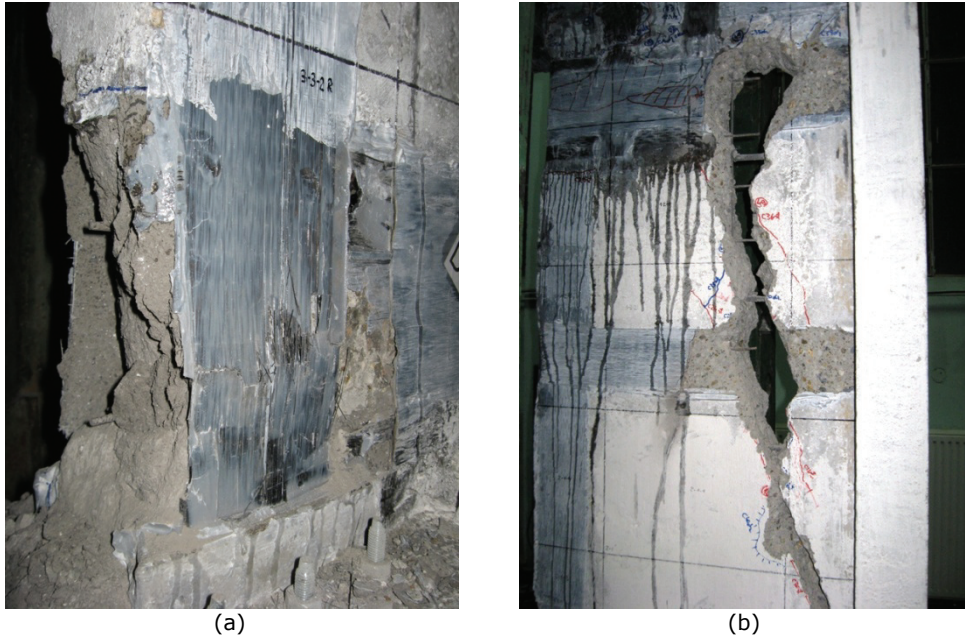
Failure detail PRCWP 5-S/E3-T/R: (a) concrete crushing is revealed inside the confined toe of pier#1 (obs. grid 3-3); (b) vertical sliding along the pier#2-to-wing connection (obs. grid 1-2, 2-1)
